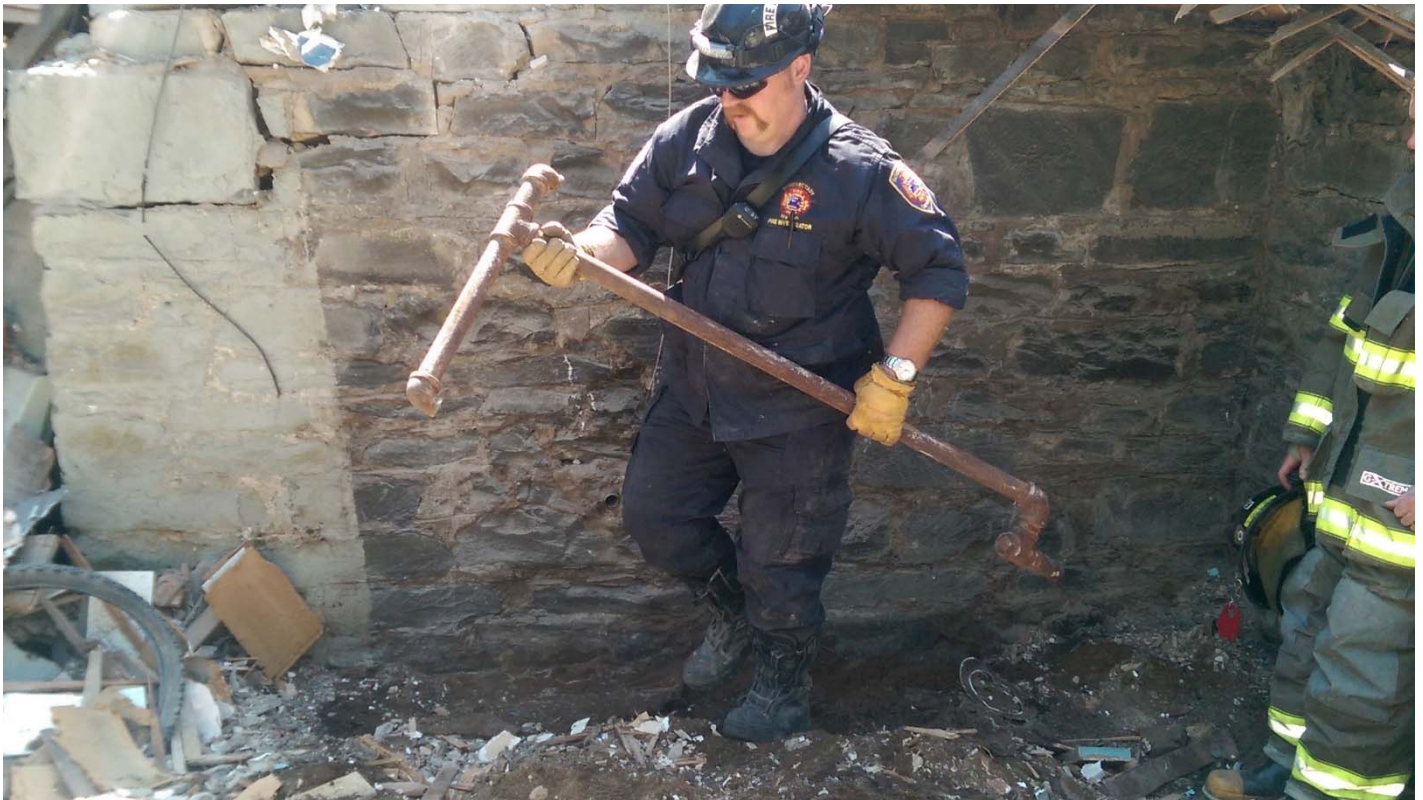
(8/11/2014) - 1 1/4 inch steel service pipe (inside).
